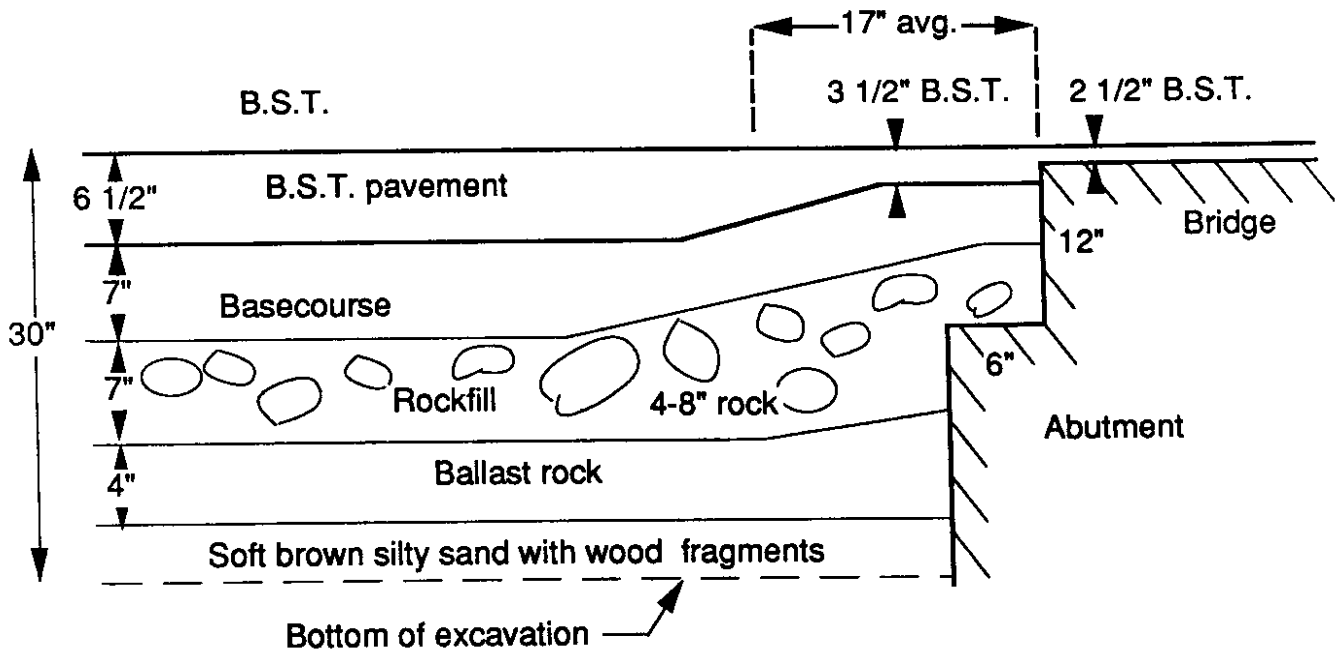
Approach Cross Section Parallel to Highway Alignment at Excavated Test Sections, San Poil River Bridge M.P. 123.
